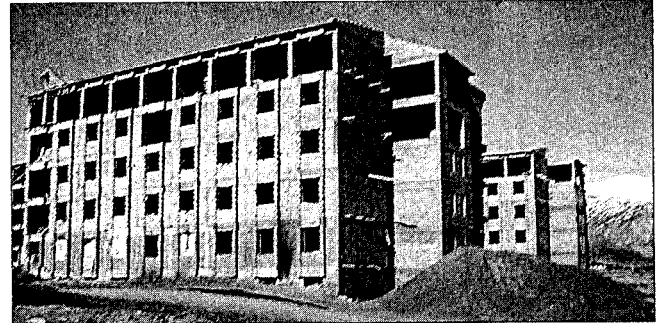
Condominium buildings with frame-shear wall interactive systems after the earthquake.
